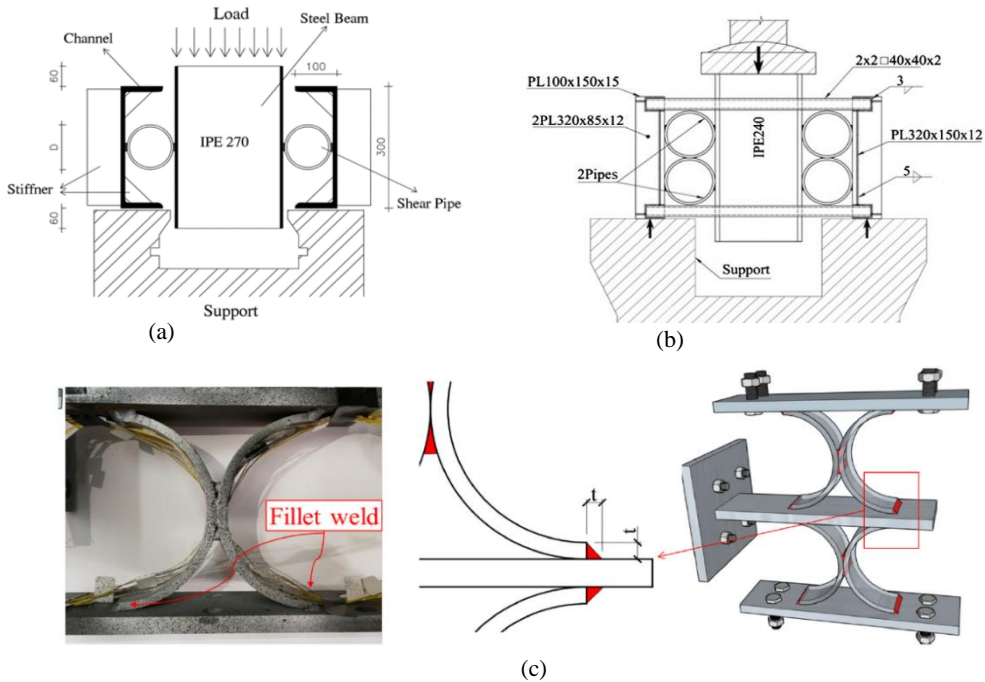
Details of steel pipe damper: (a) single pipe damper; (b) dual-pipe damper; (c) X-shaped pipe dampers
